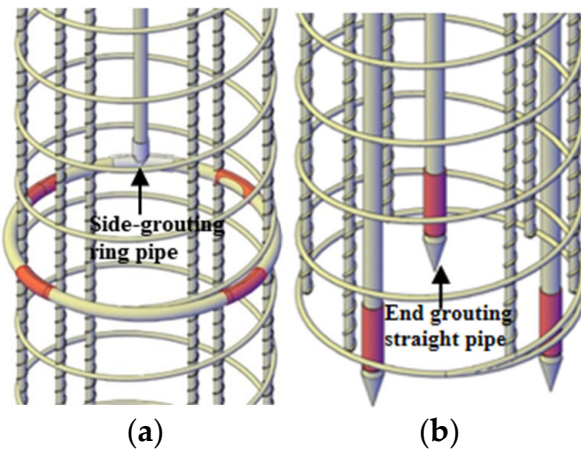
Grouting pipe arrangement diagram: (a) Side grouting ring pipe and (b) End grouting straight pipe.
